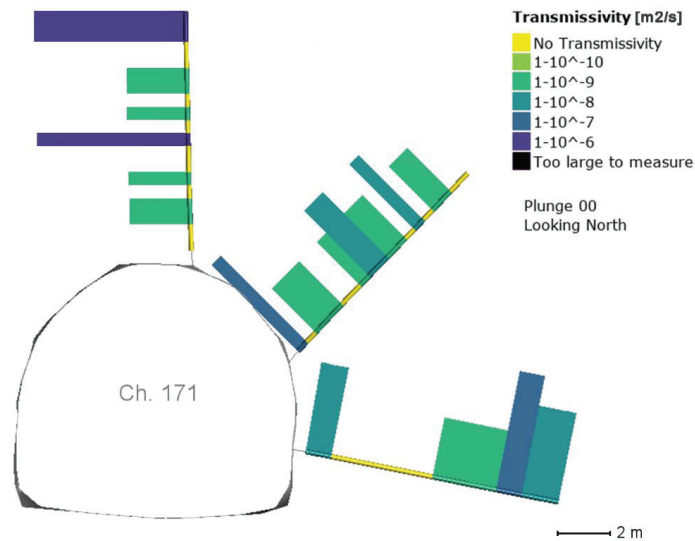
3D model showing tunnel profile, hole positioning and hydraulic transmissivity at Ch. 171. The bar plots along the test holes are in log scale (Paper III).
